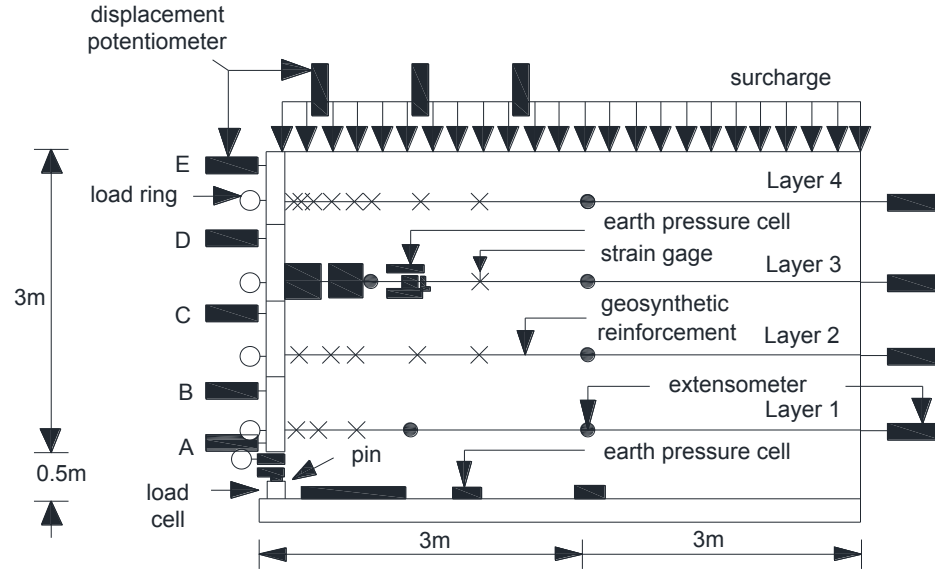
Initial configuration of the retaining wall and the instruments that was installed for monitoring in Karpurapu and Bathurst work (1995)
